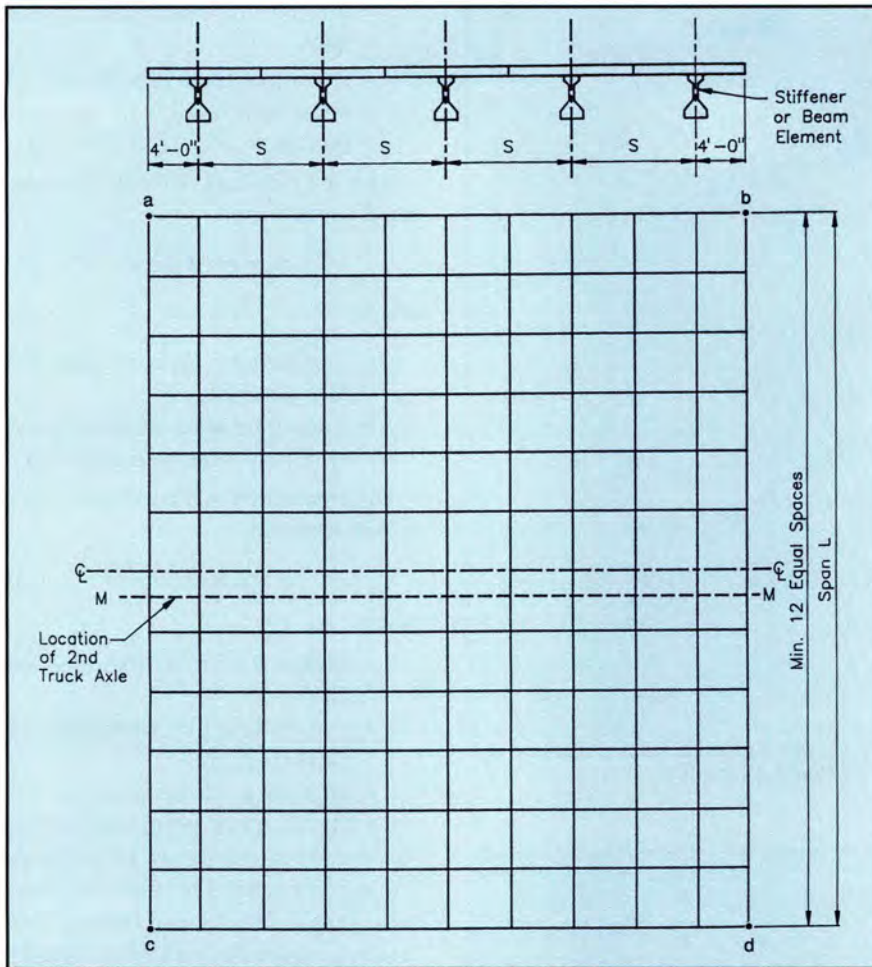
Typical bridge discretization (dimensions shown as an example only).
